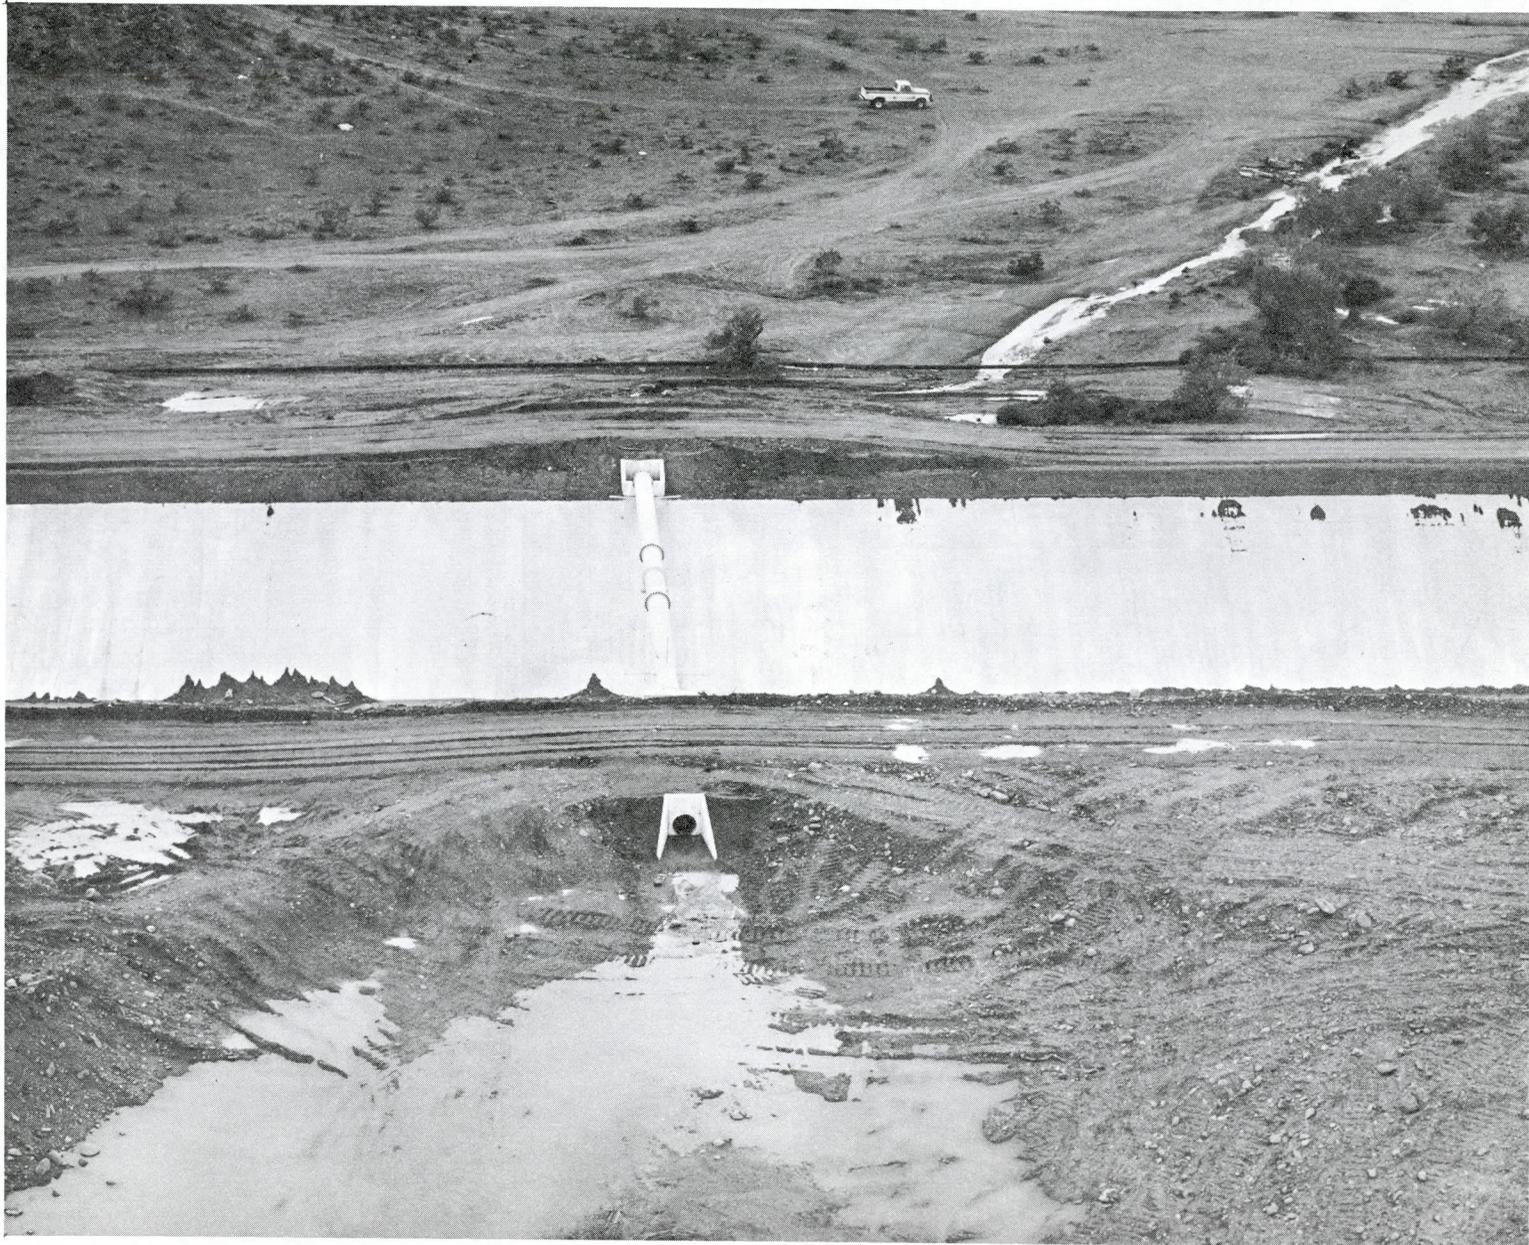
Pipe Overchute--Granite Reef Aqueduct--Central Arizona Project. Aerial view of a typical pipe overchute similar to those that would be constructed on the Salt-Gila Aqueduct. Photograph No. P344-300-02424 NA.
